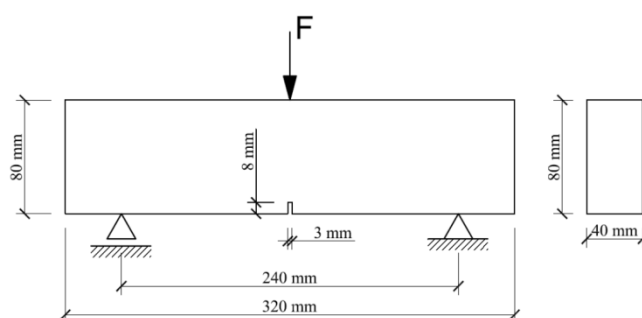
Concrete notched beam under quasi-static three-point bending: geometry and boundary conditions of beam (F -vertical force)
